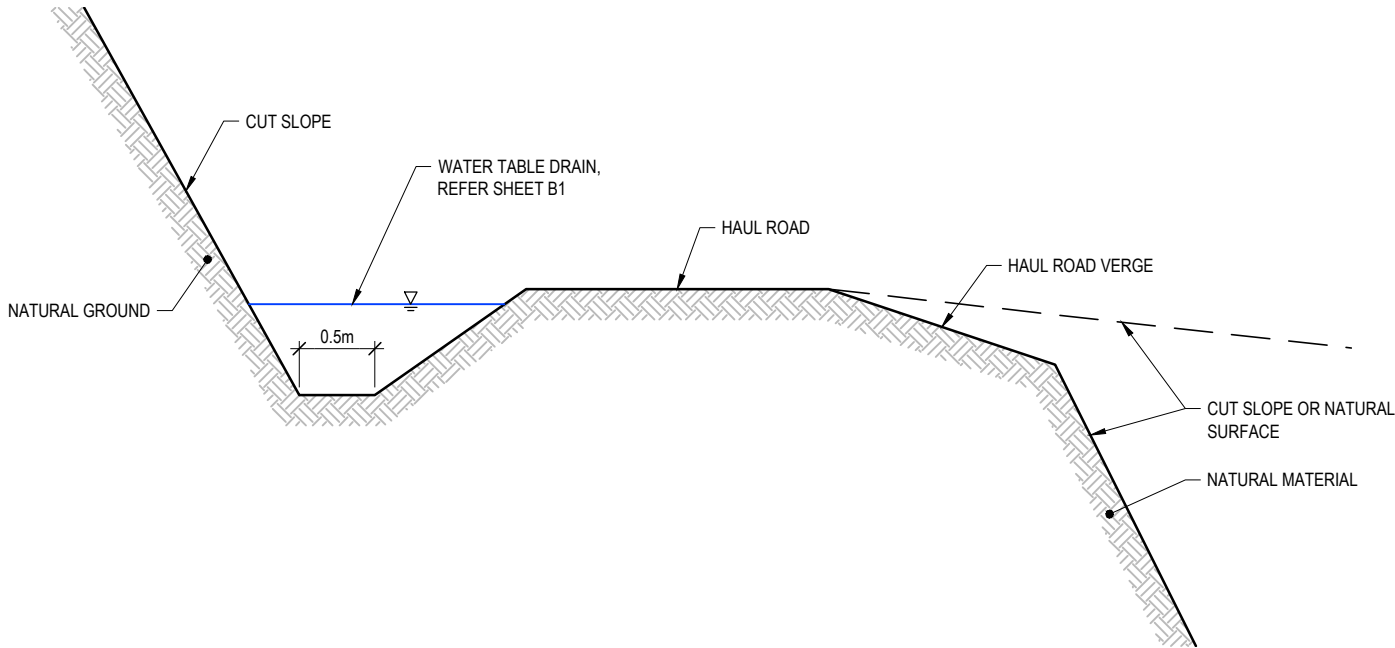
HAUL ROAD CUT AND CHANNEL DETAIL
